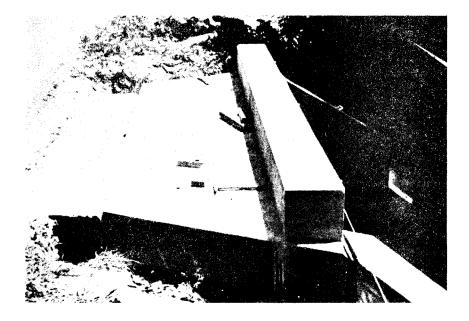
Widened Rte. 714 Bridge in Suffolk District.
